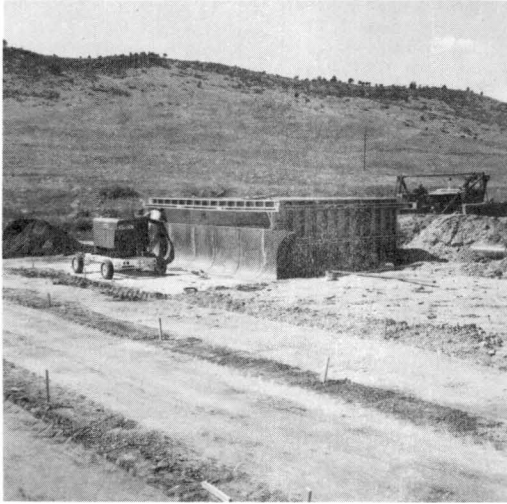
A heavy sheet metal splashway connected the headbox to the concrete apron
